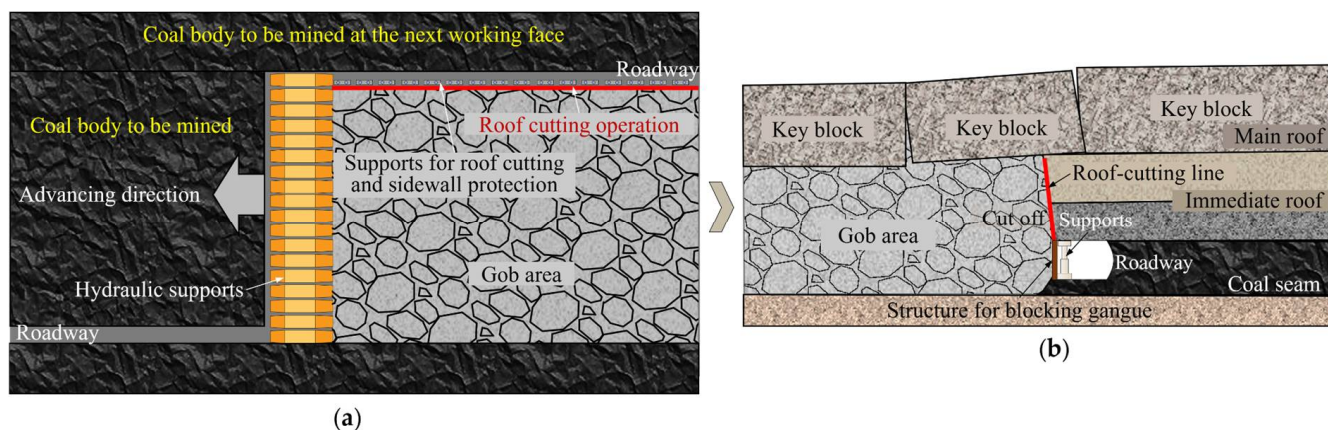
Cutting roof and retaining roadway technology in the “N00” construction method. (a) Plane diagram of “N00” construction method (b) The diagram of the retained roadway.
